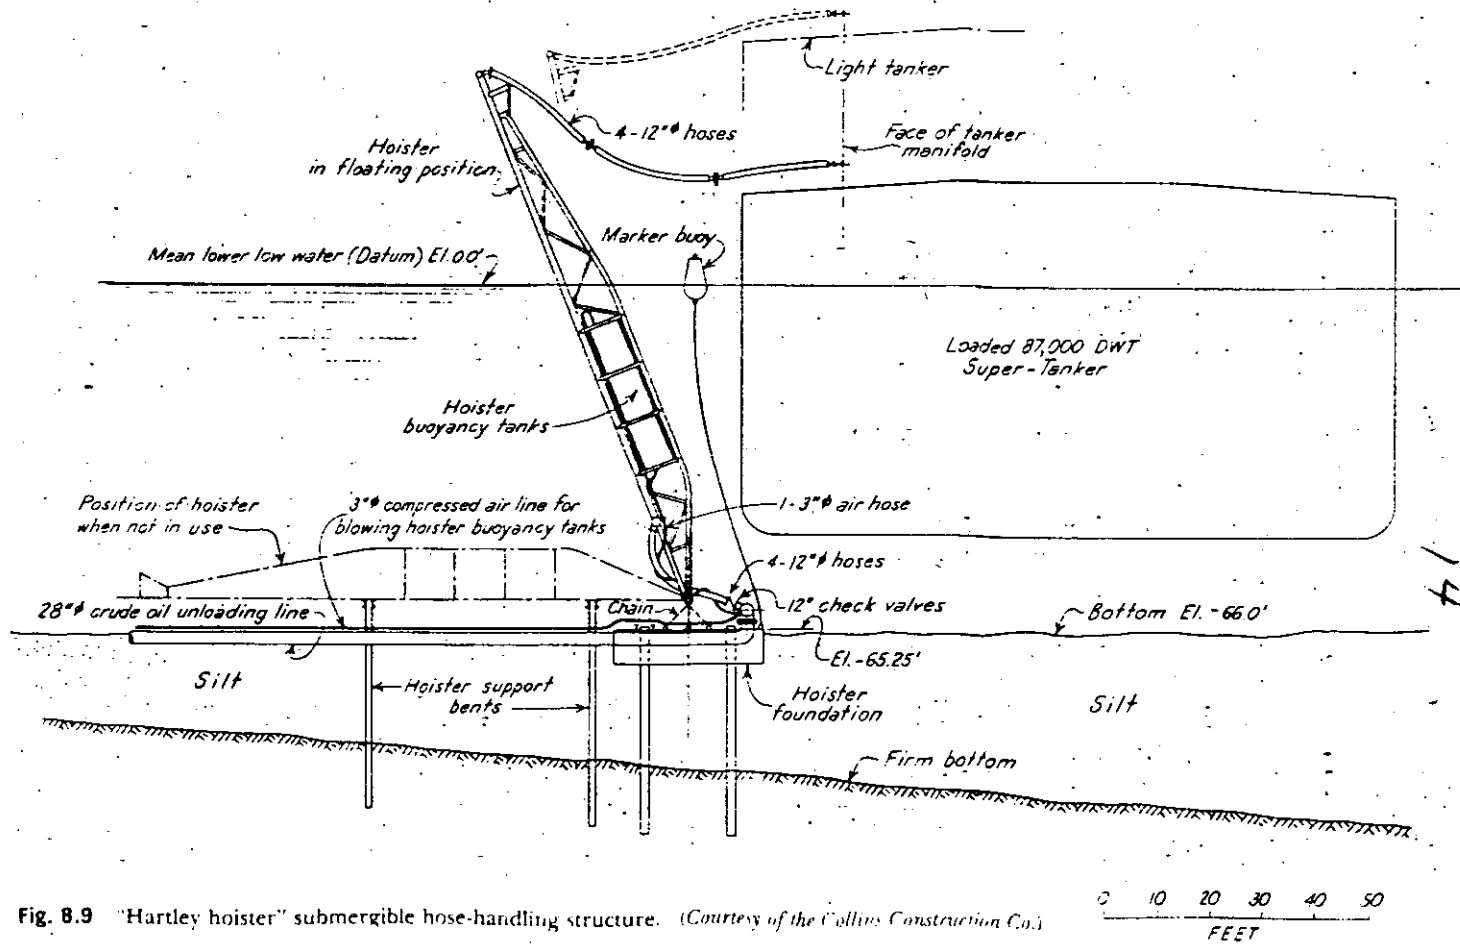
"Hartley hoister" submersible hose-handling structure. (Courtesy of the Collins Construction Co.)
